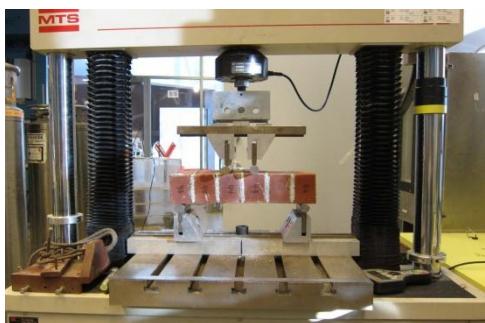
(a): Flexural Test Arrangement of Brick Masonry
